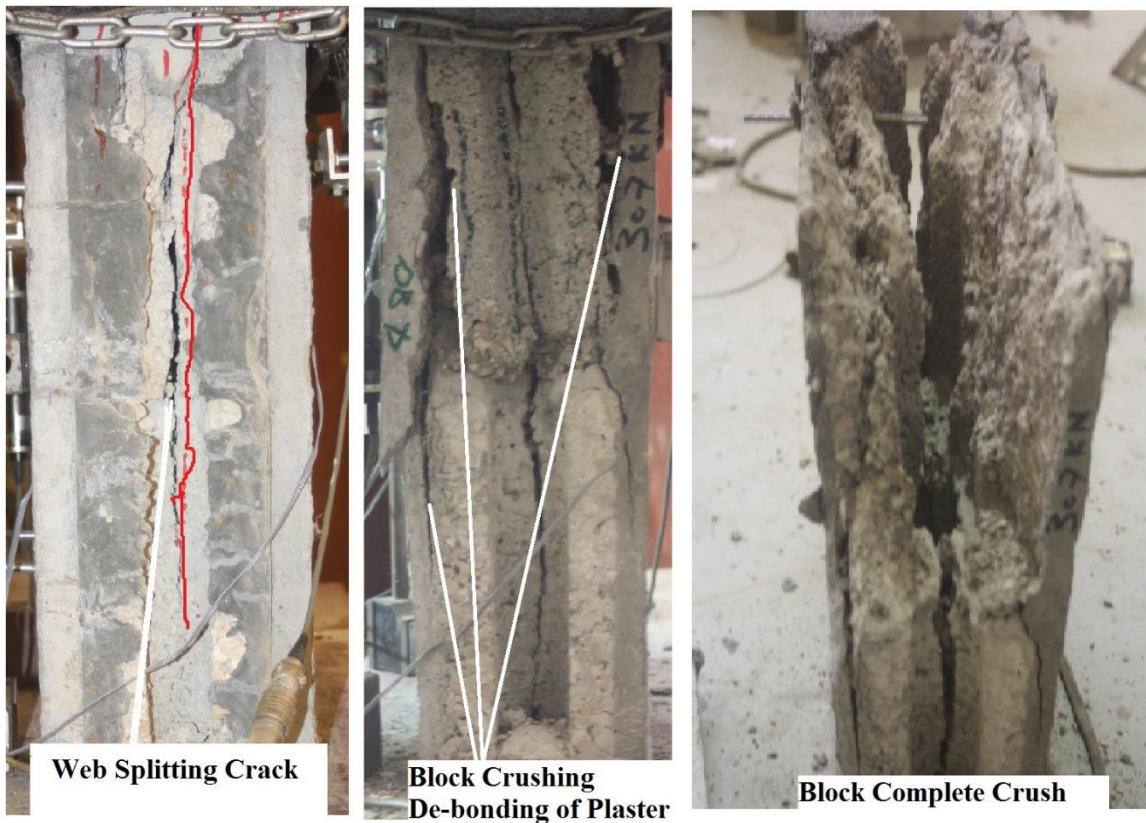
Failure Mode of NCMWR Prism Two Sides Retrofitting
